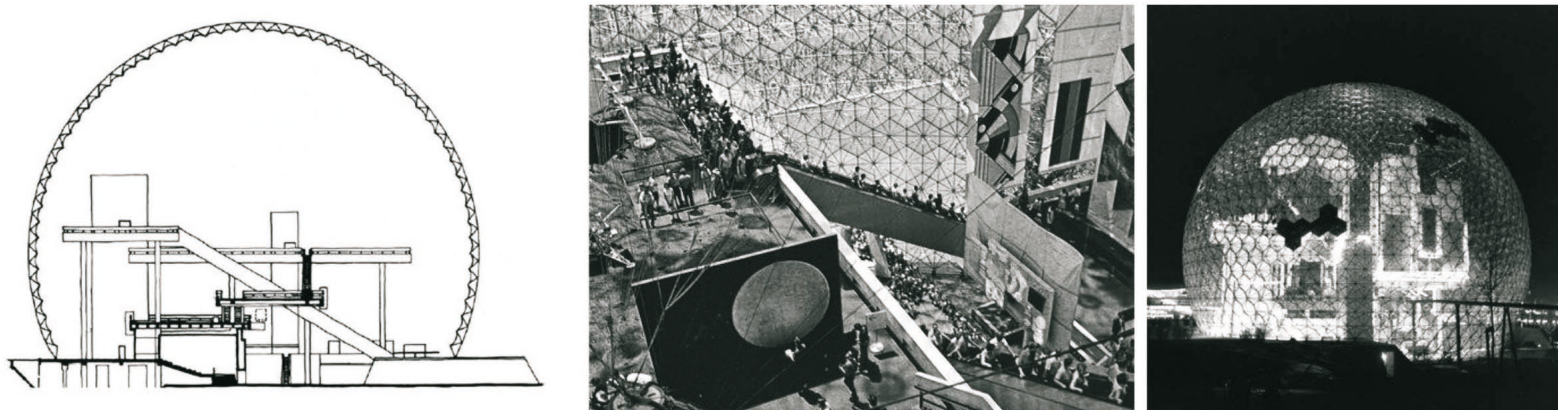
Buckminster Fuller, Shoji Sadao, USA Pavilion, Expo'67, Montreal 1964, a) cross-section through the dome and exhibition platforms, b) view of the interior of the Pavilion c) night view of the Pavilion with the sun protection system; source: [J. Massey 2010]
